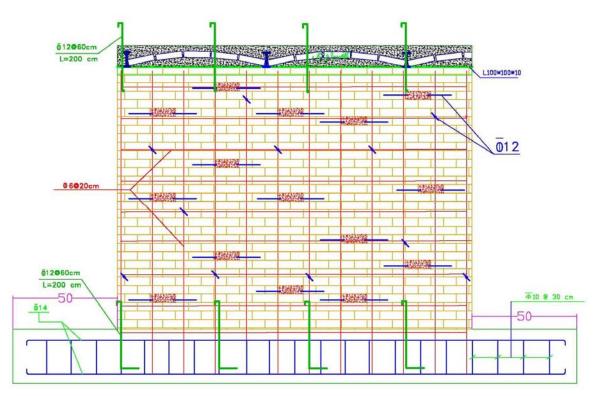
Adding reinforced concrete ties beneath the wall and connecting the wall masonry to it and to the floor
